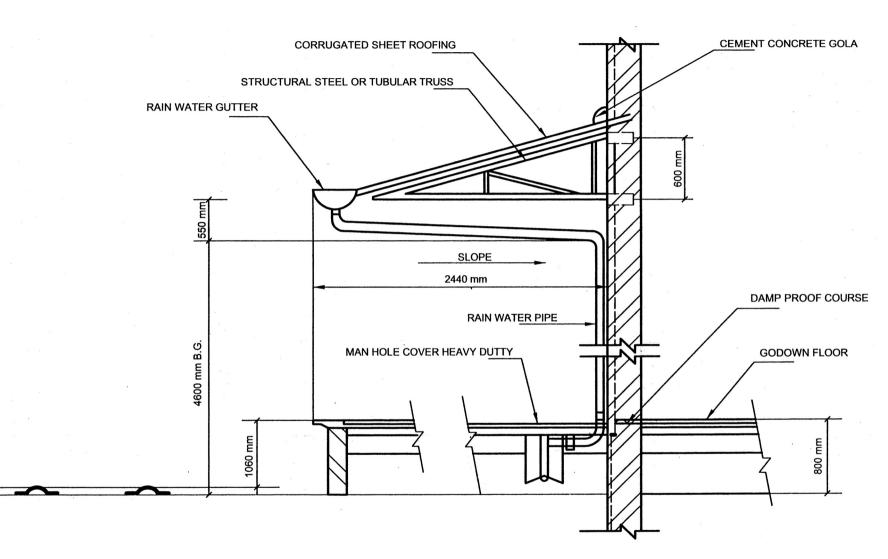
DETAILS OF EAVES GUTTER AND RAIL-SIDE PLATFORM
